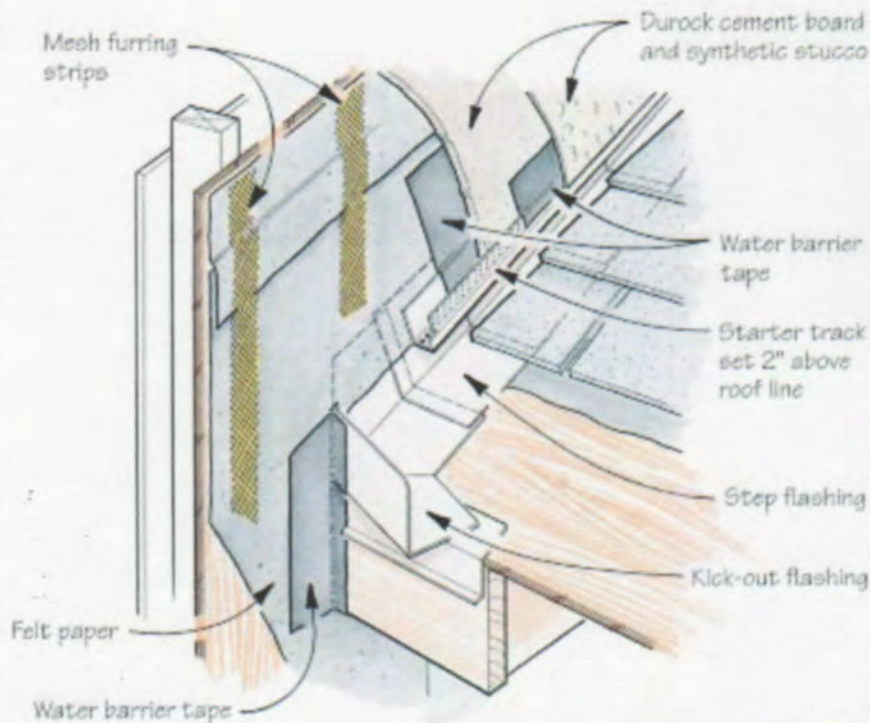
Missing kick-out flashings at roof-wall junctions are a common source of leaks in EIFS failures. The author prefers a heavy-gauge copper for these flashings.
